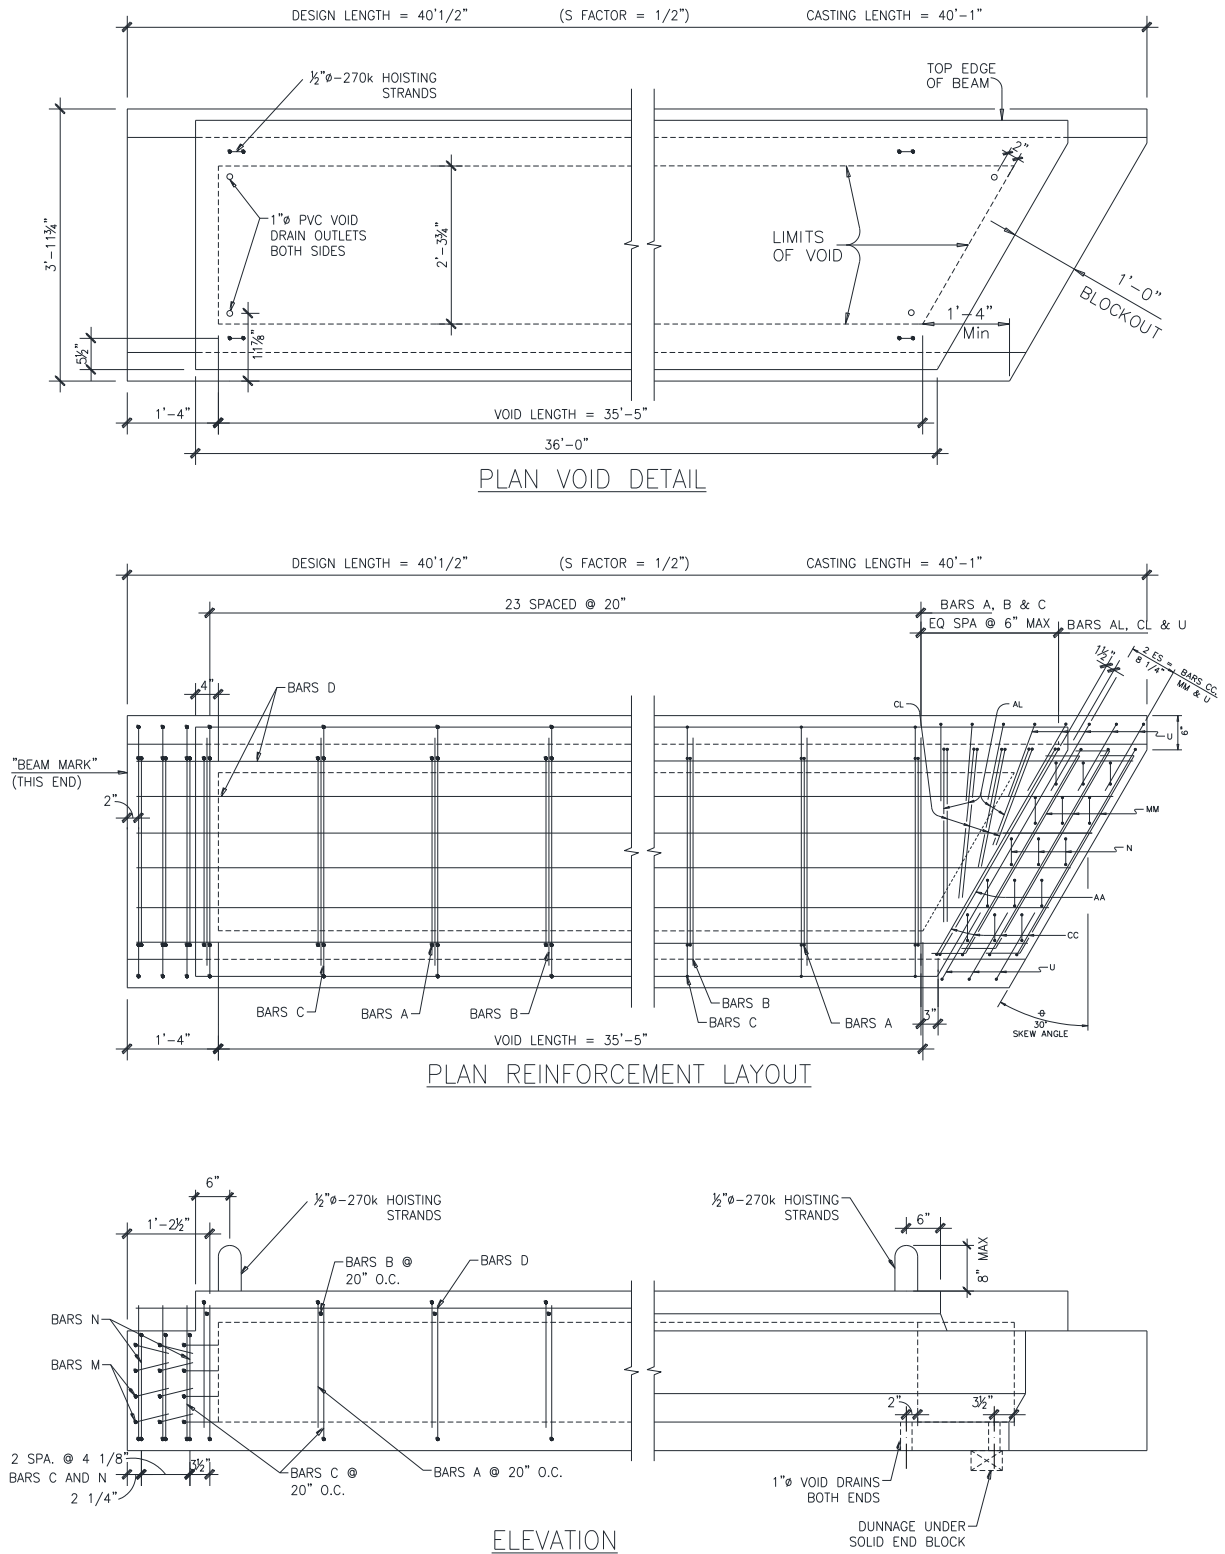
Plan and Elevations for 4B28 box beams: BB-01, BB-03, BB-06 and BB-08.
